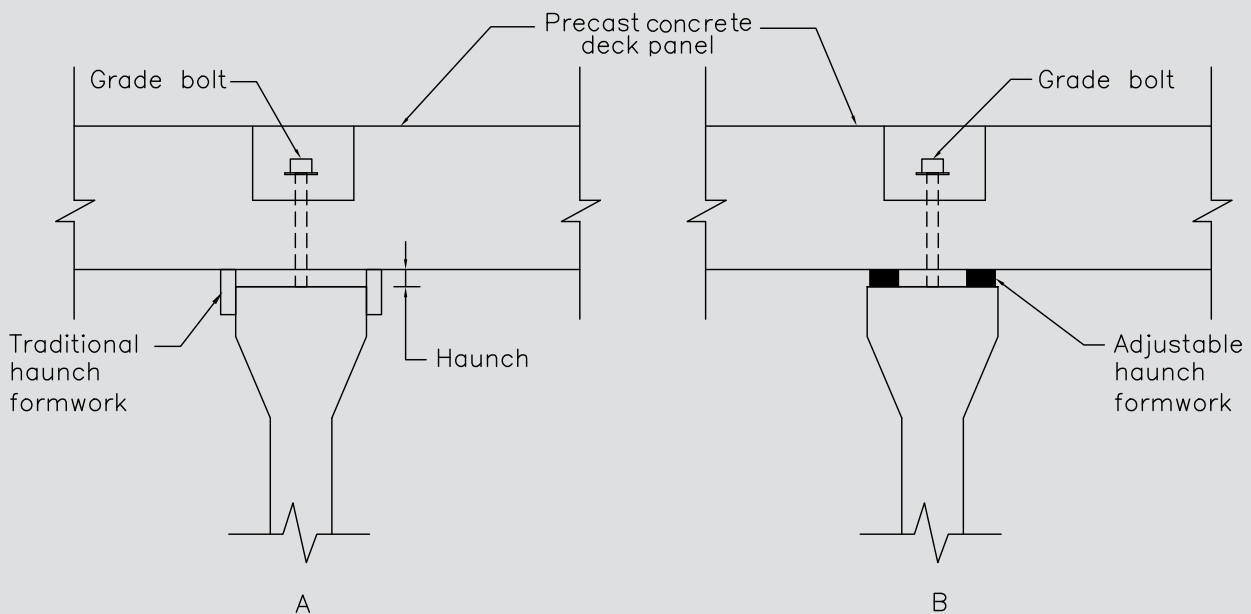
Typical cross section of a precast concrete bridge deck with traditional formwork and with adjustable formwork.
